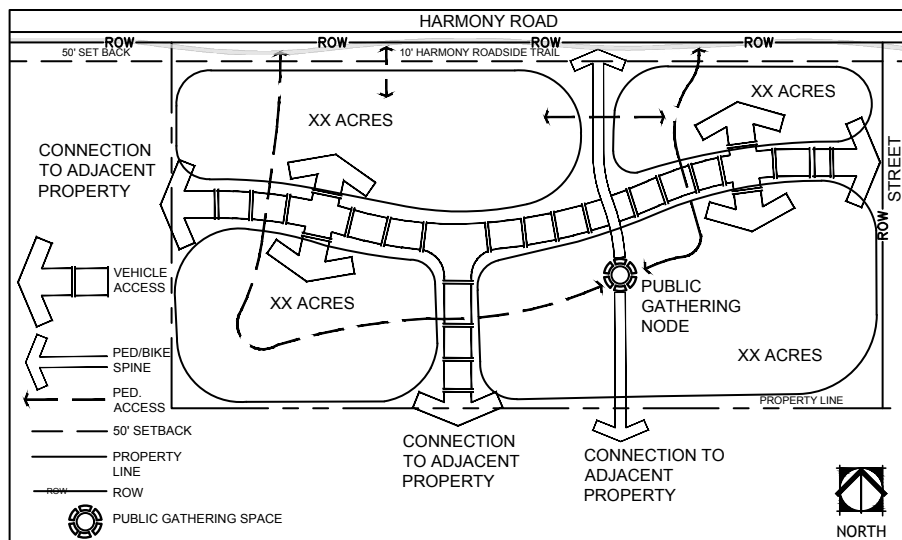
DEVELOPMENT STRUCTURE PLAN
